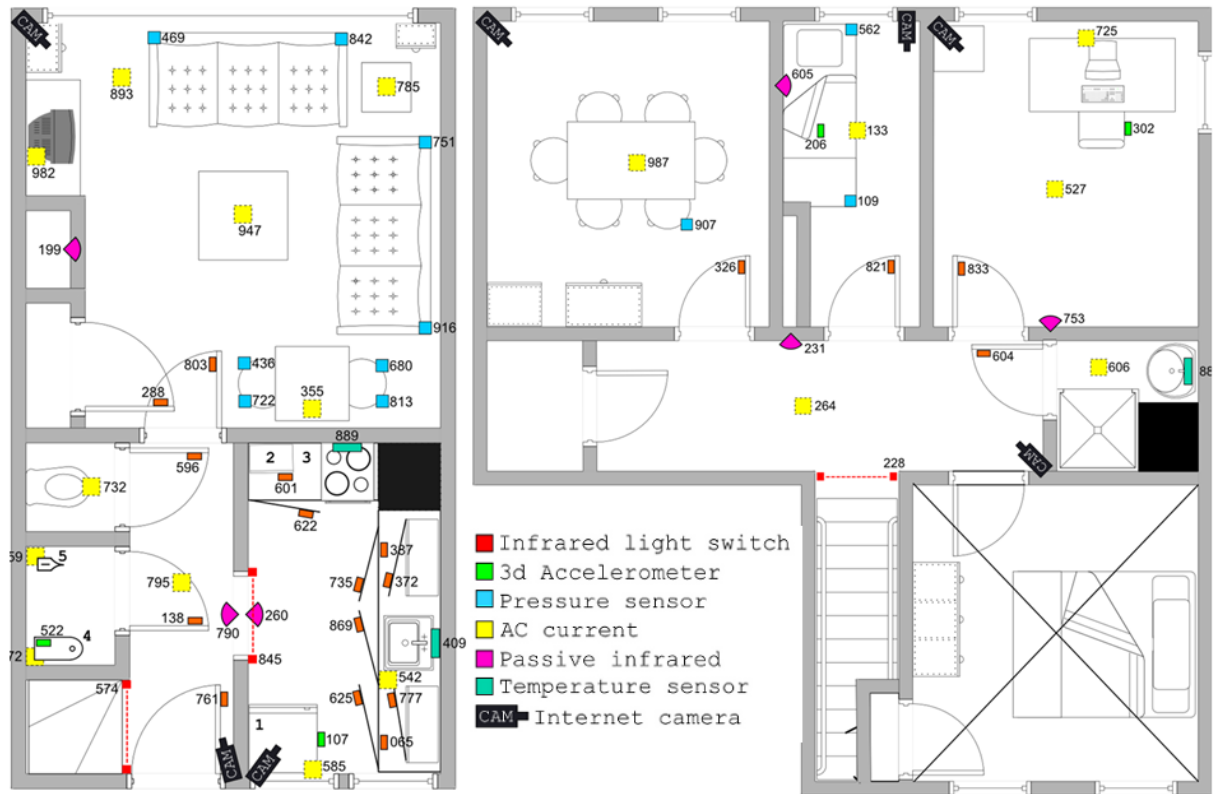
Floor plans of the ground floor (left) and upper floor (right) of the experiment house, including sensors and cameras.
